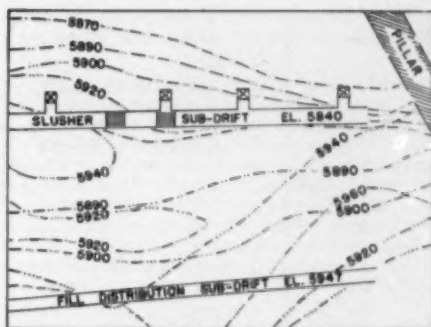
Plan showing stope development layout superimposed on ore outline contours.
